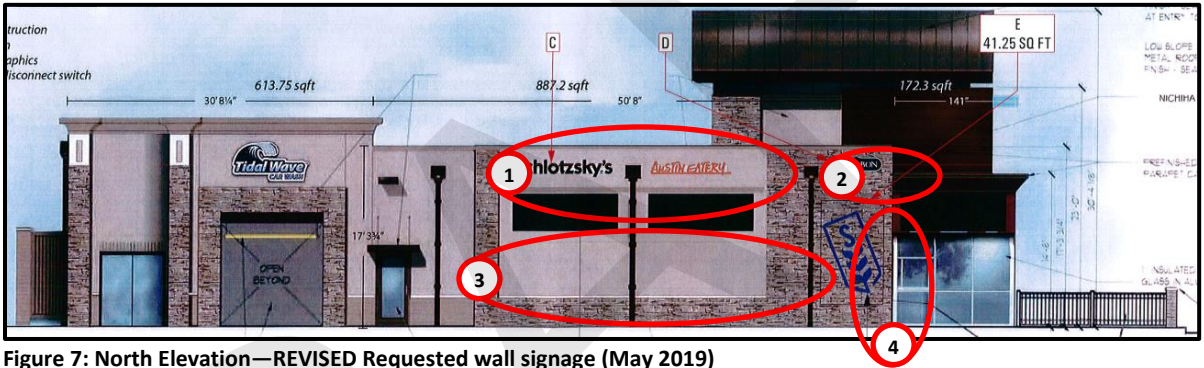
North Elevation—REVISED Requested wall signage (May 2019)
